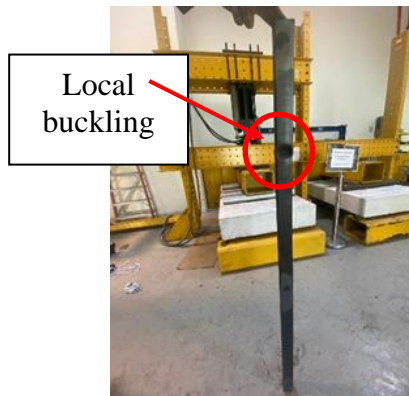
Failure modes for a single SHS column of S2-H2-SHS
